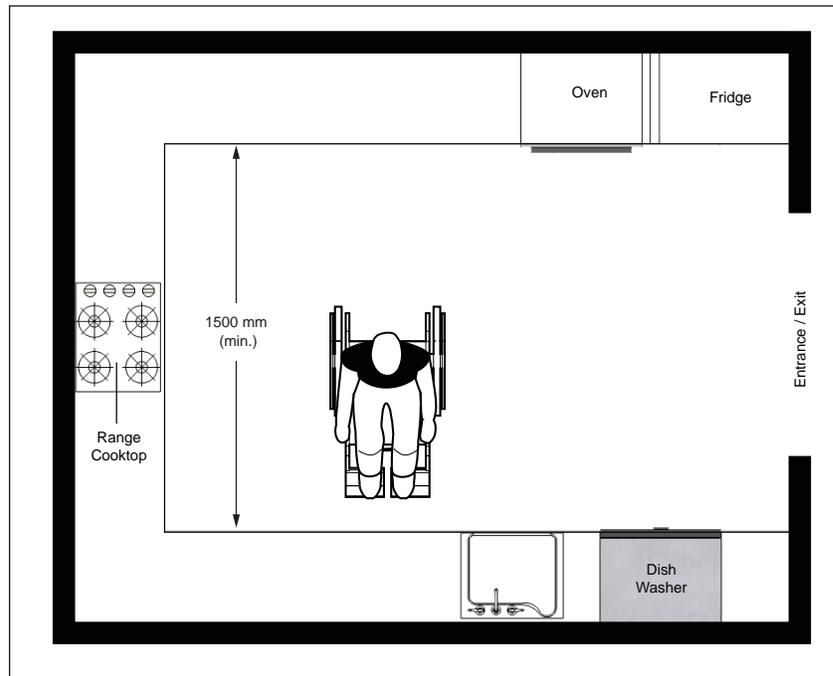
Pass-Through or Galley Kitchen - Plan View
